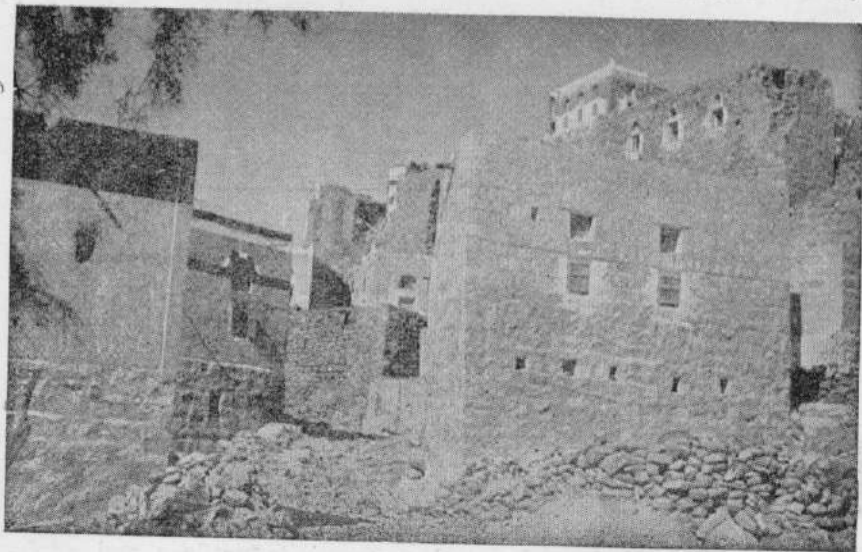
Damage to corners and walls in upper floors of dwellings, random provision of wood pieces over window in village Dhi-Hawlan.
